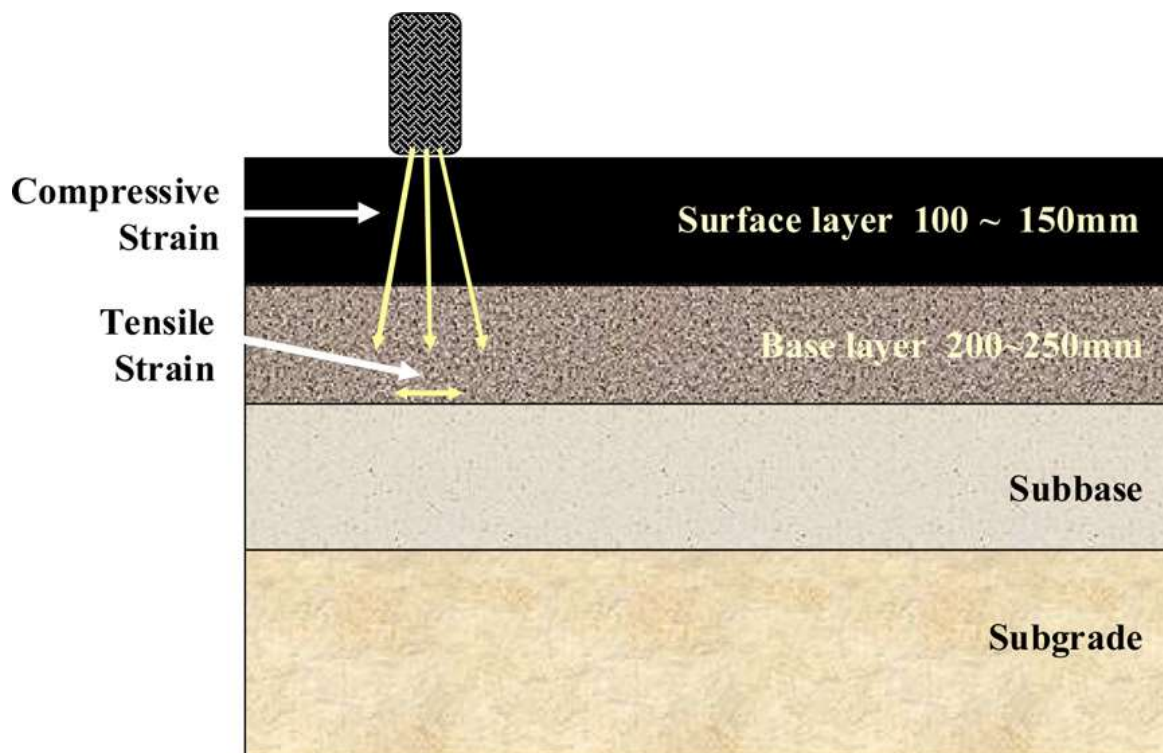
Structural layers in an asphalt concrete pavement [12].
